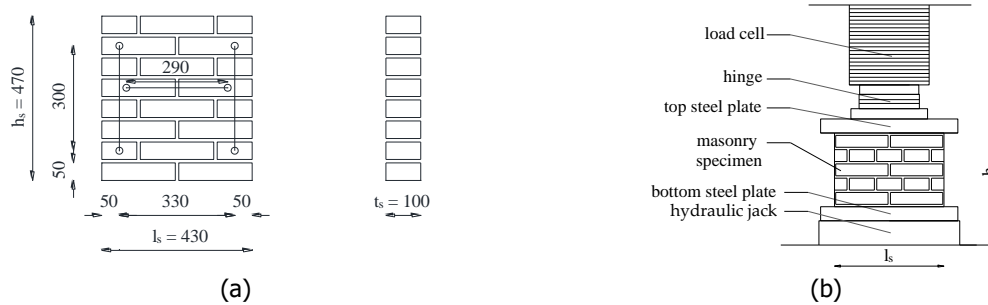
(a) Dimensions of the single wythe clay brick masonry wallets; (b) compression test set-up.
